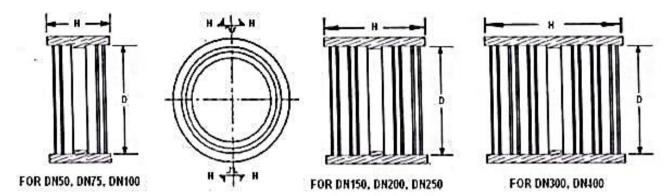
TYPICAL HUBLESS COUPLING JOINT-INSTALLATION
